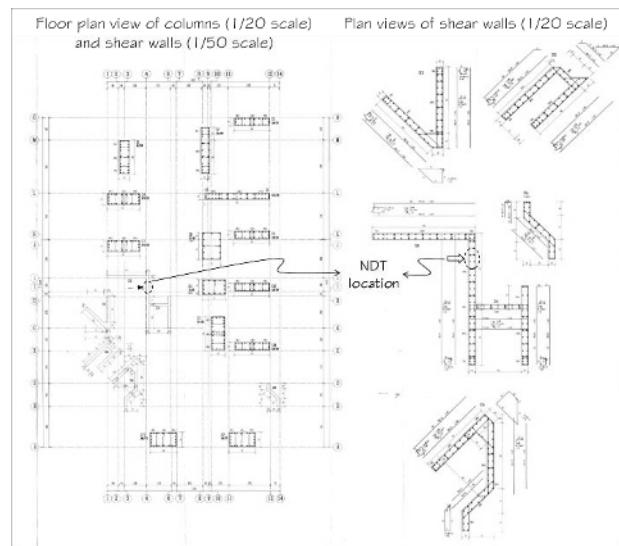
Plan views of columns and shear walls on a typical upper floor (indicated scales are on actual structural drawings), also showing the concrete NDT location on floors 1-15
